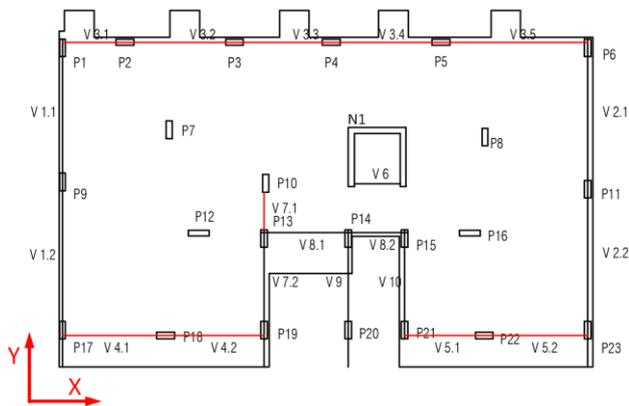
Identification of all the structural elements used in the initial structural design.
